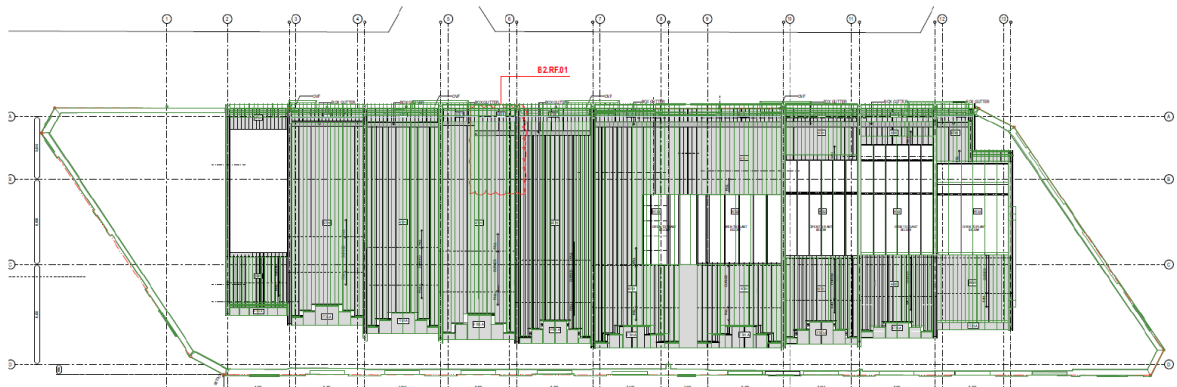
Comparison between the approved roof plan and the proposed roof plan showing the changed form as a result of the new lift core location
